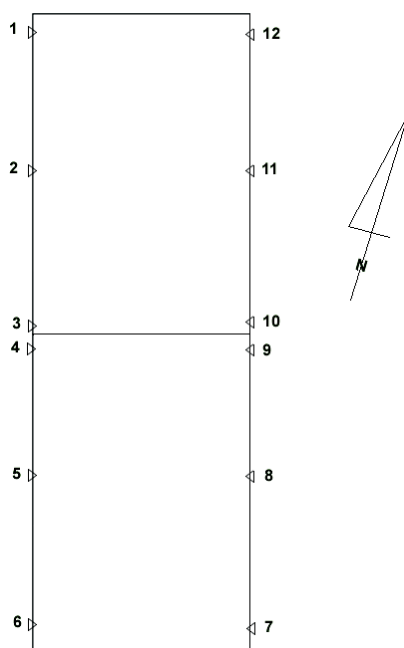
Foundation benchmarks position on the building at Krucza St.
